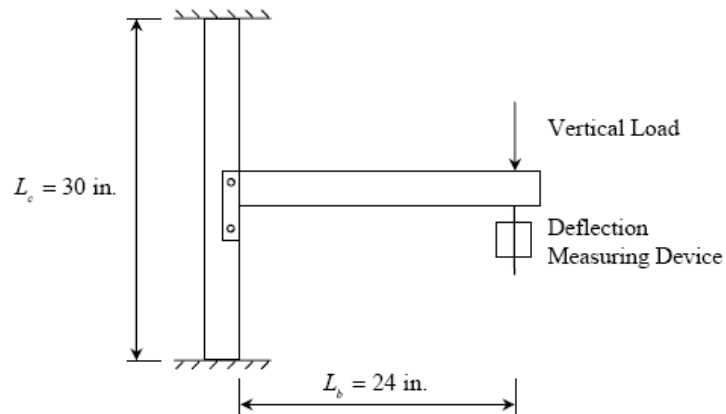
Cantilever test – beam to column connection test (RMI, 2000)
